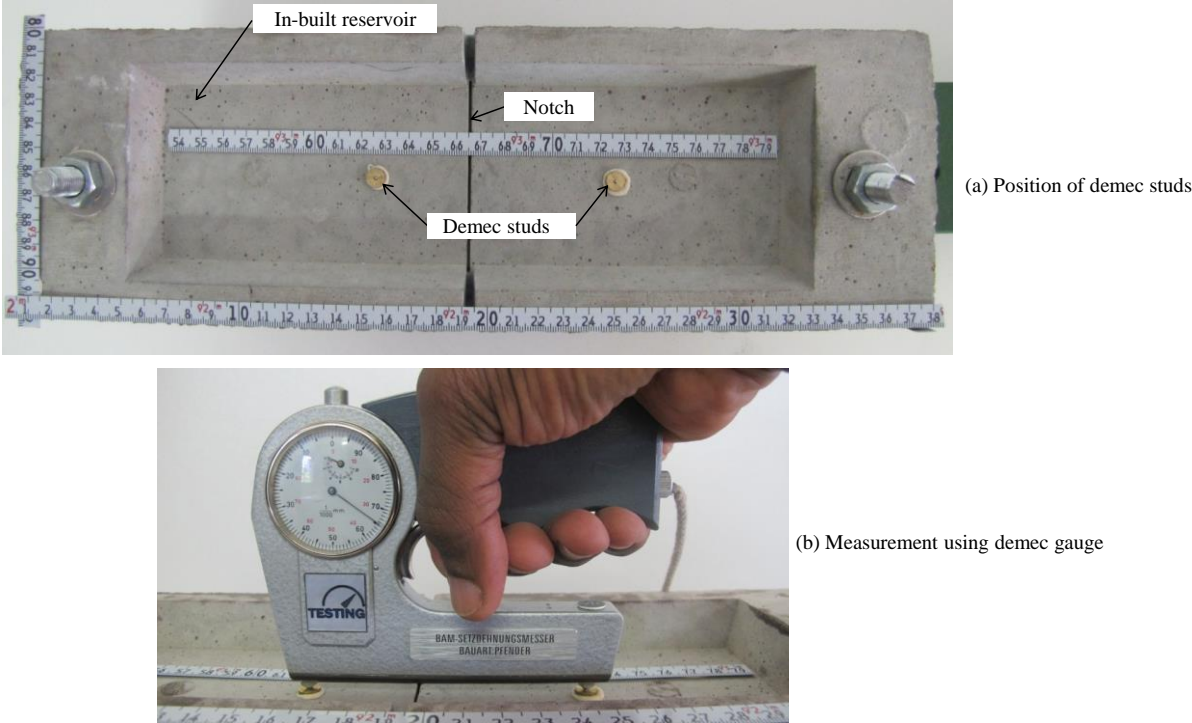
Photographs showing position of demec studs and measurement using demec gauge
